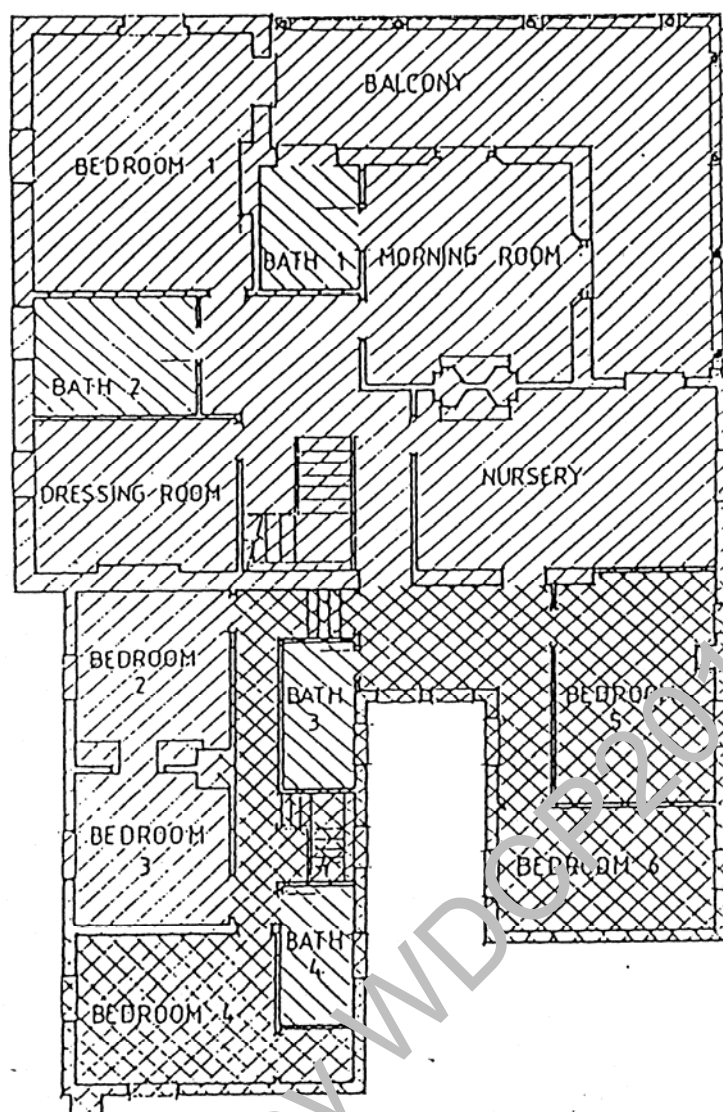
Plan of Ground floor Indicating Significant Fabric.
